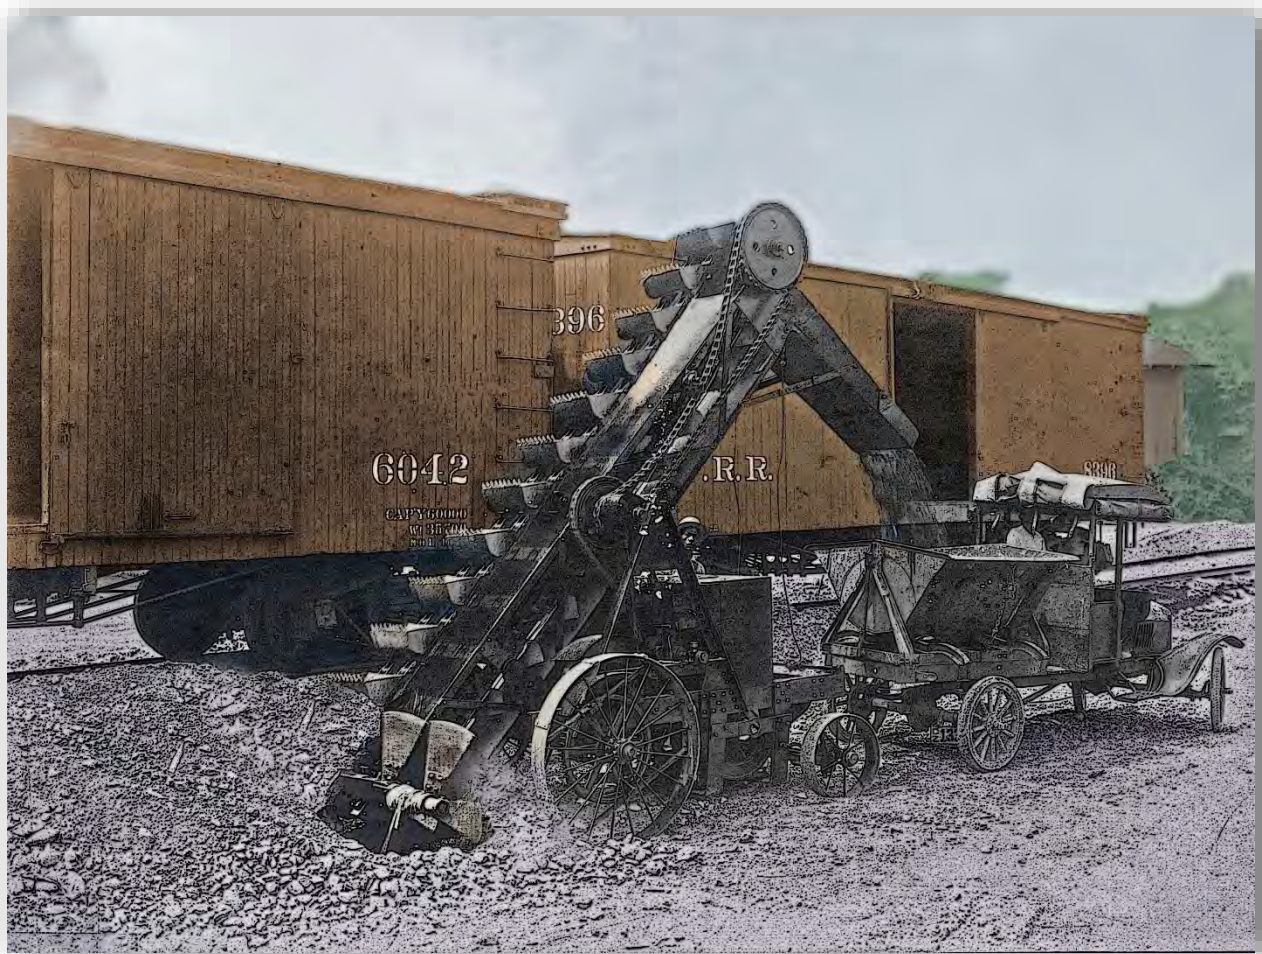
JUNE 1920: WAGON LOADER LOADING SAND AND GRAVE ON SMALL TRUCK.
